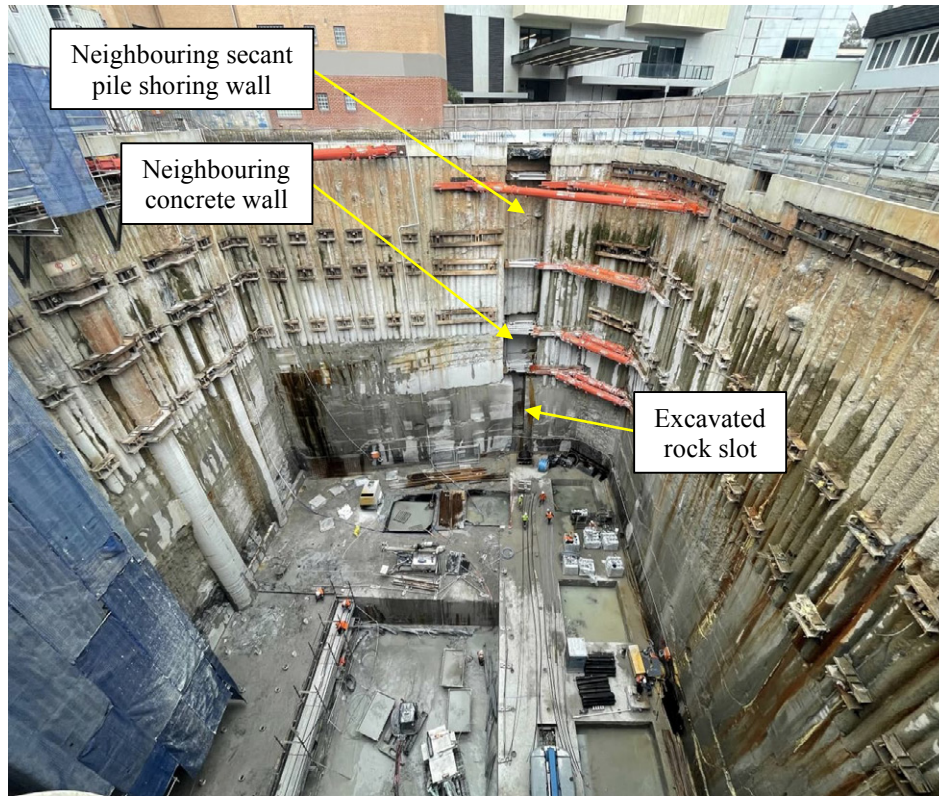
Rock slot extending toward the neighbouring basement walls, looking north
